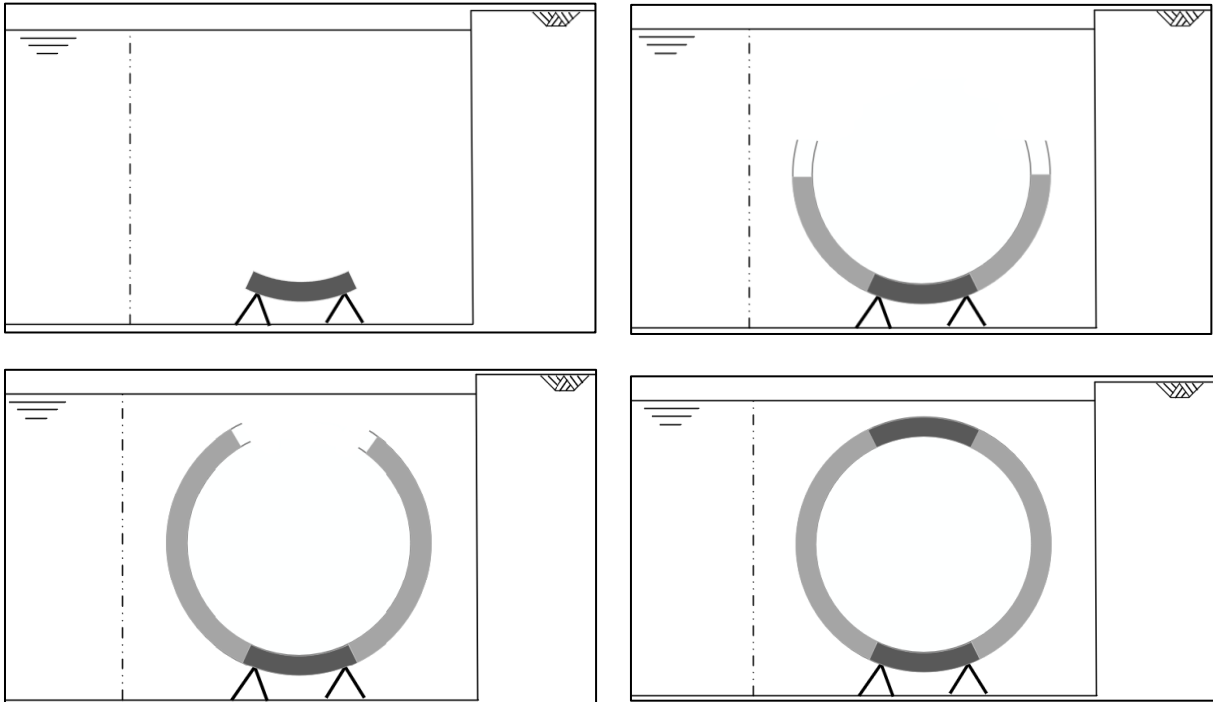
Printing outer and inner shell and casting of concrete (2D view), submerged. The bottom and top element can be made with prefab elements (dark grey).
